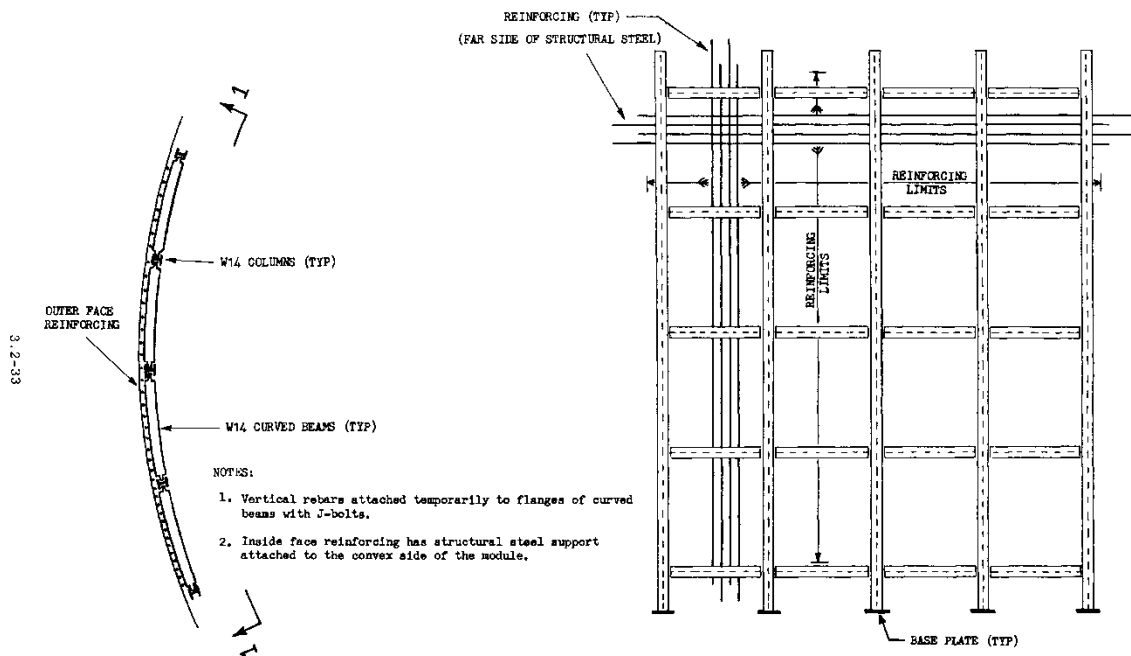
Containment wall reinforcing modules (p. 3.2-34 [60]).
